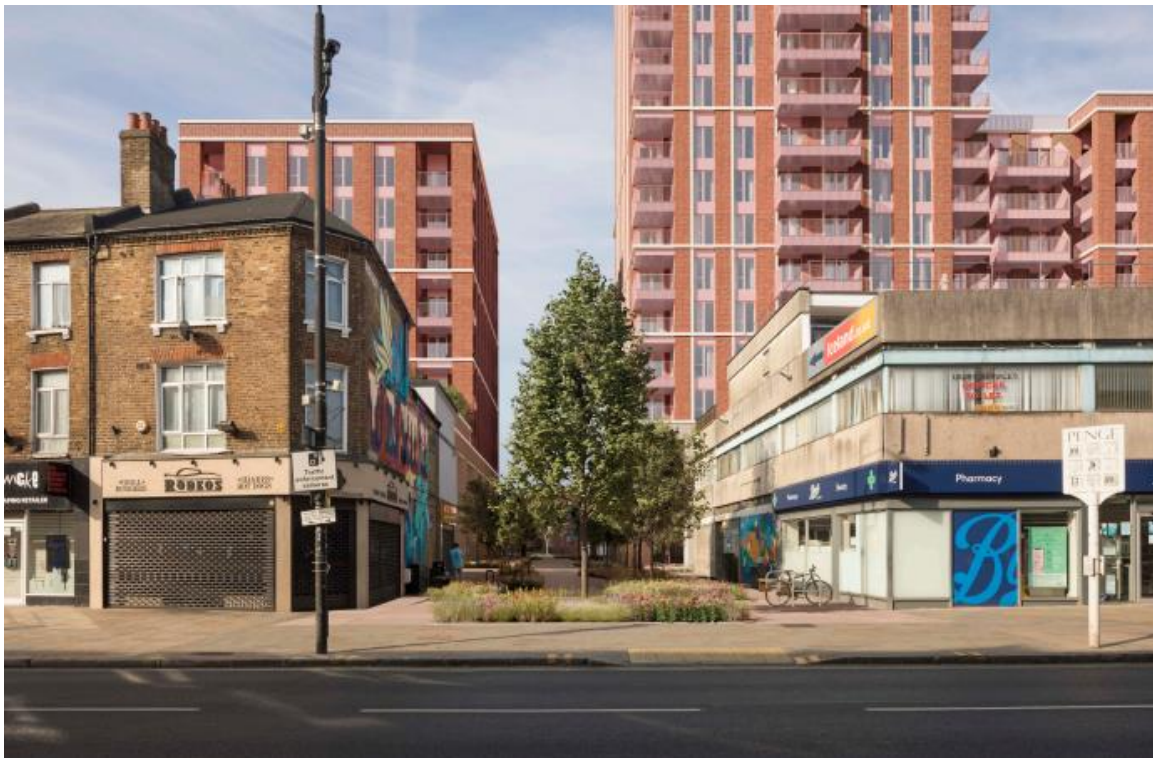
View 18 - As Submitted and Amended Proposed Development: High Street, looking west (HTVIA Addendum).
